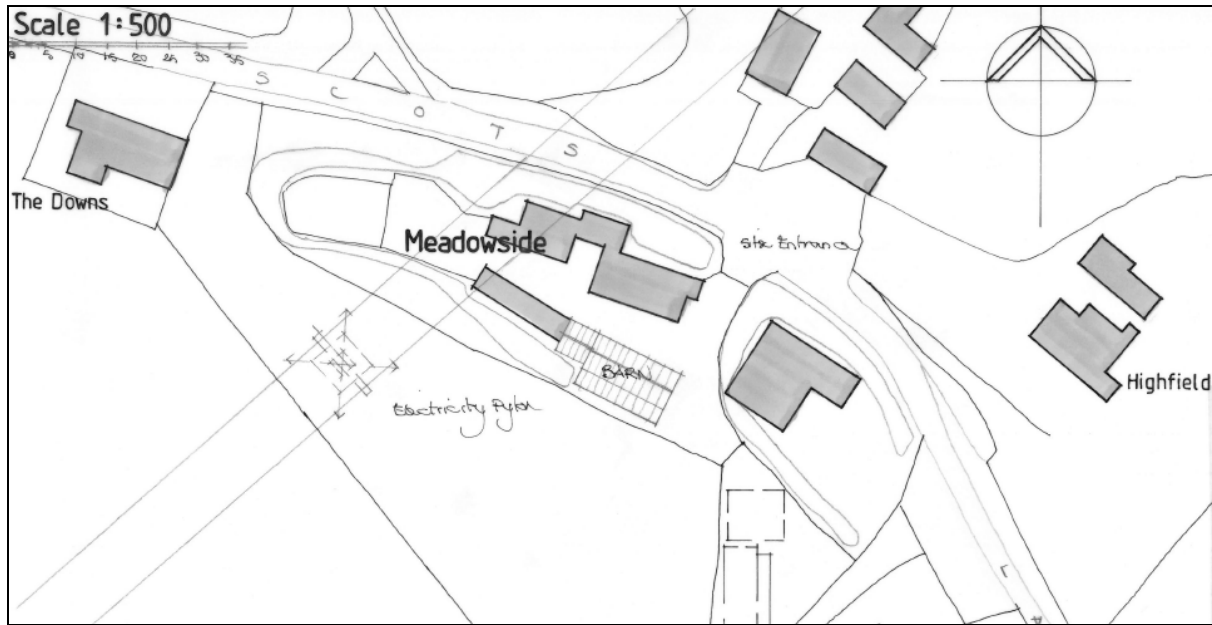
Proposed block plan (NB. Barn is the proposed dwelling)
